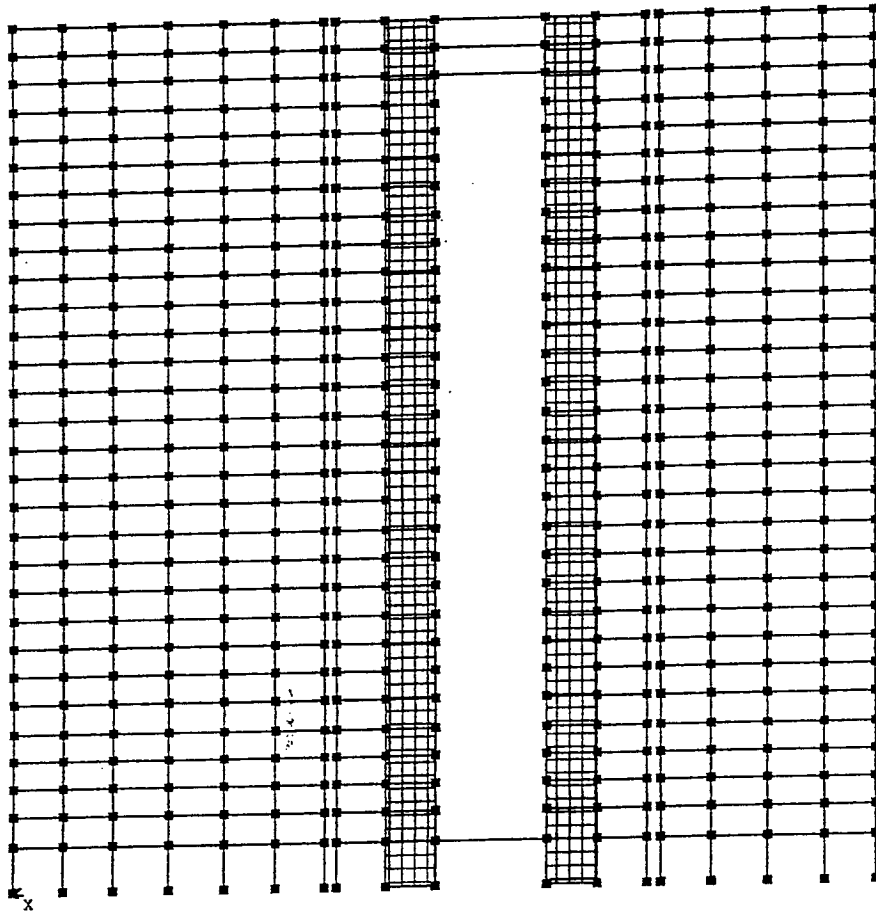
Model of the S-K Redesigned Building Retrofitted with Single Shear Walls
